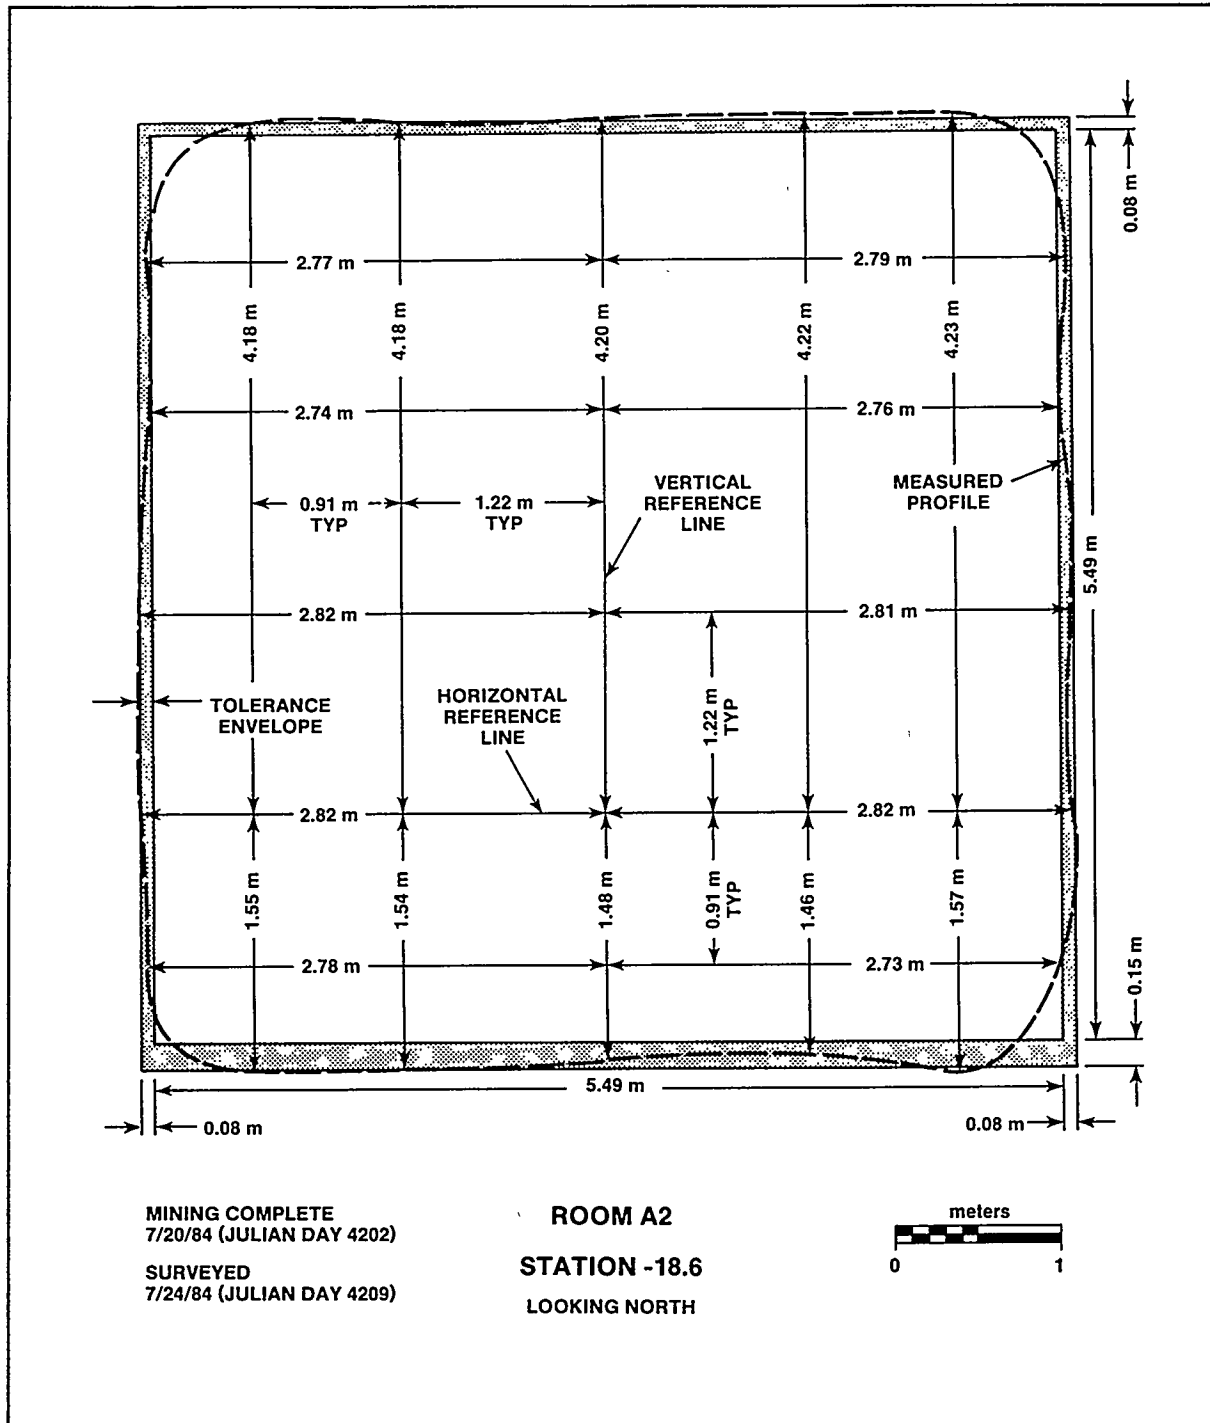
As-Built Cross Section of Station -18.6 m, Room A2
